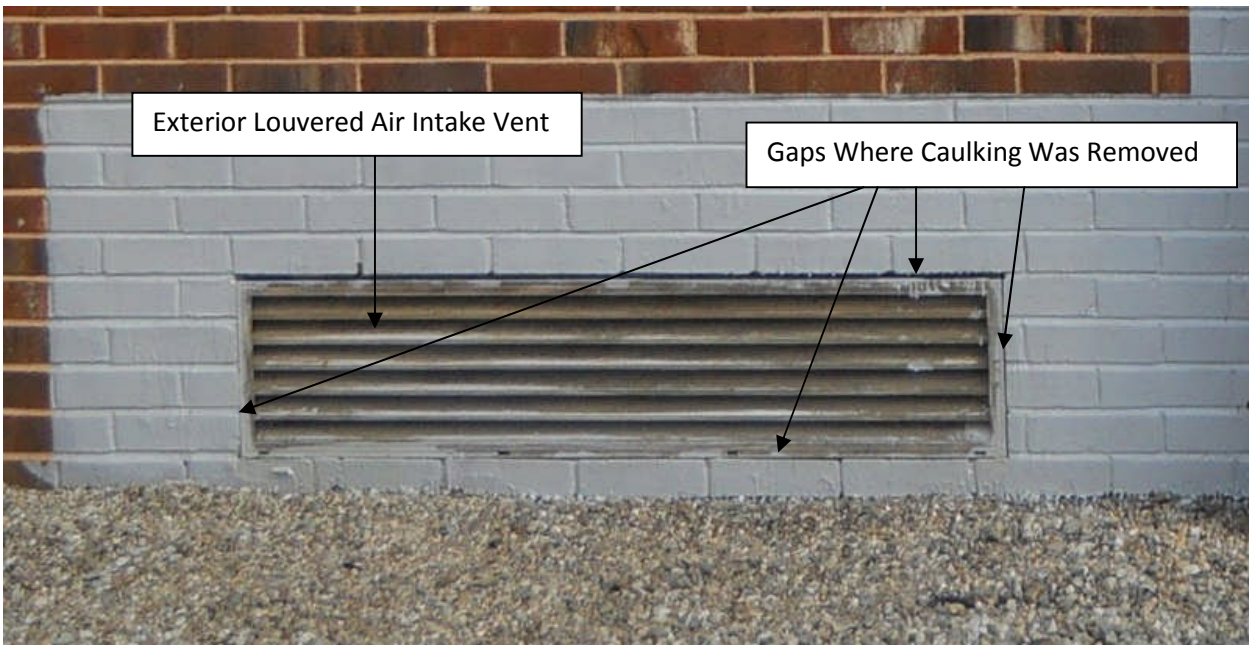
Typical Exterior Louvered Vent Structure: 200 Wing Classrooms.
